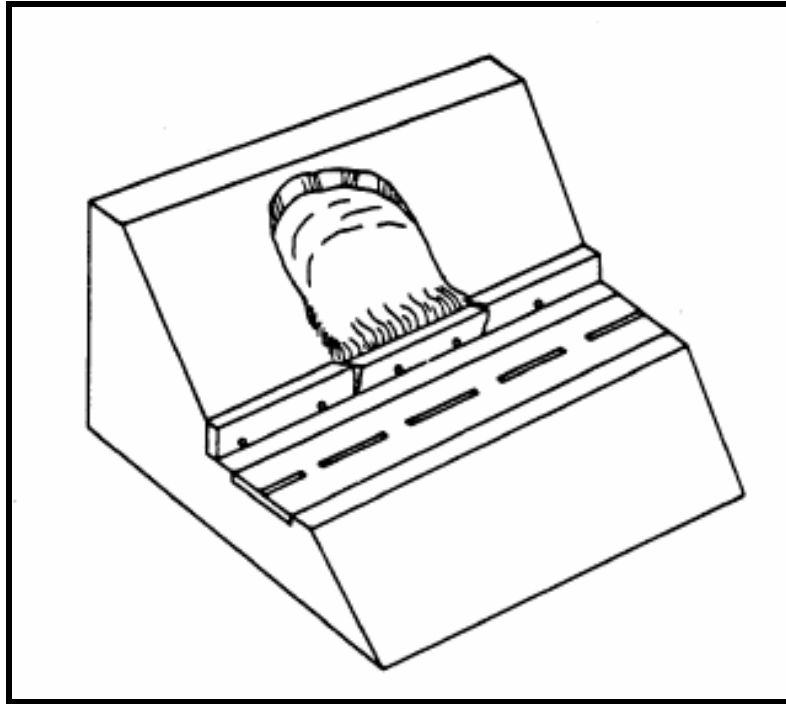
Impact on retaining structure (tilted on retaining wall) (FHWA, 1988)
